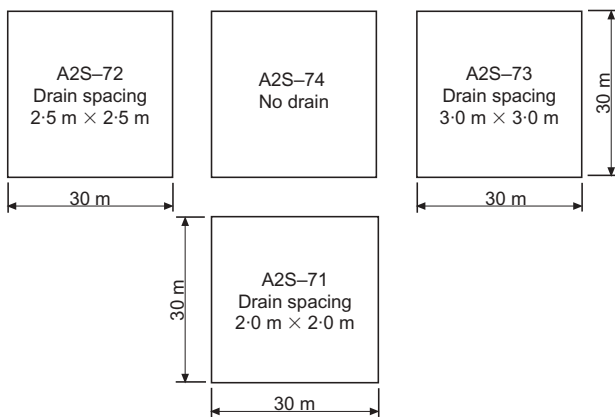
Layout plan and vertical drain spacing of sub-areas at pilot test site
